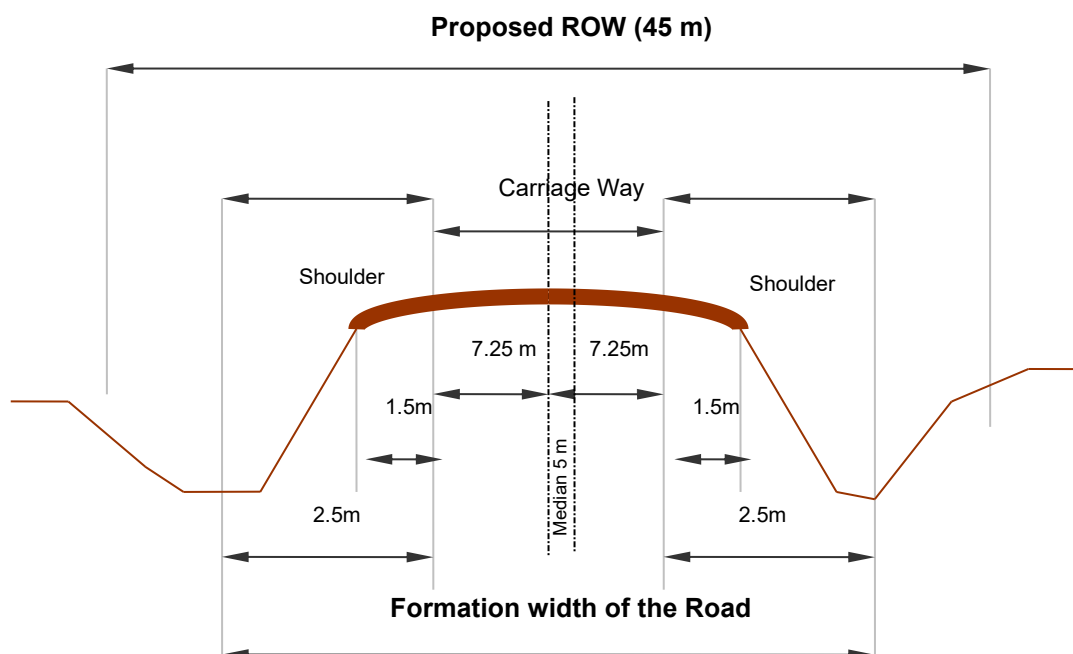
A cross section showing a typical Formation width of the Bypass Road
